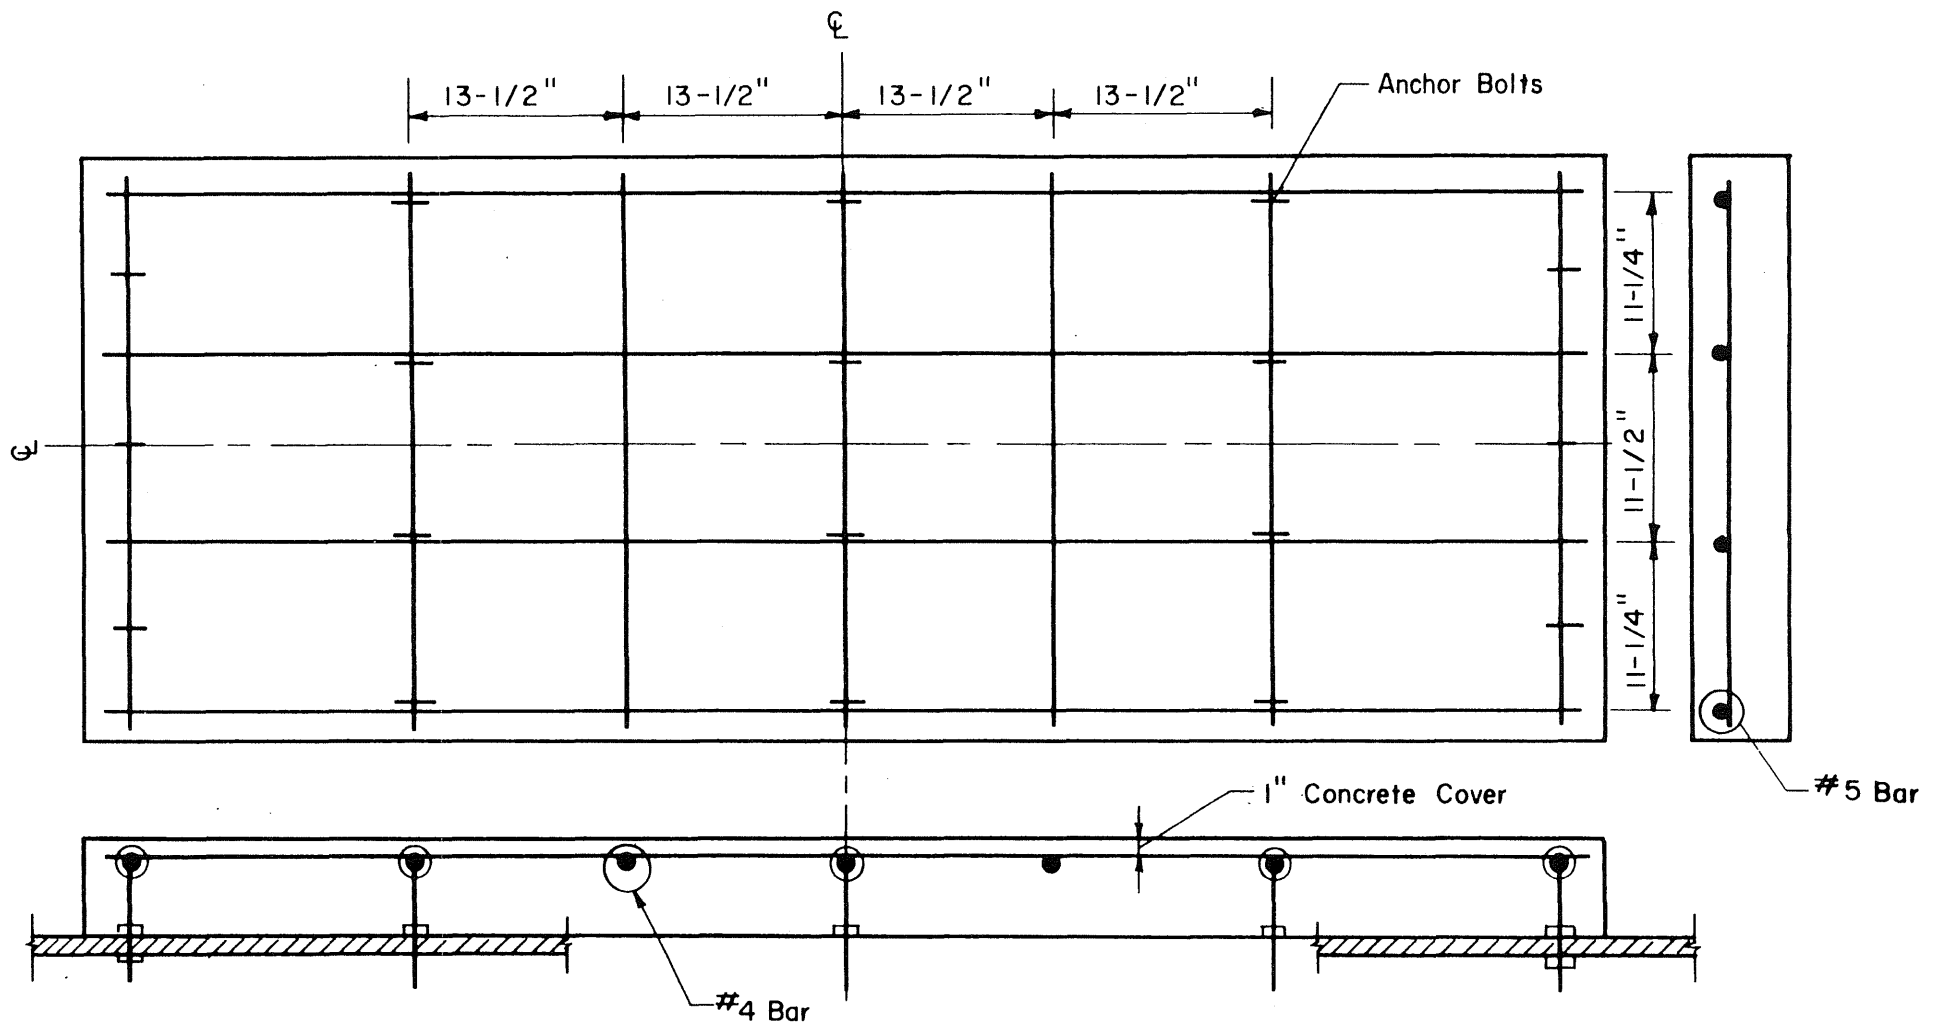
LAYOUT OF REINFORCEMENT – TYPE B – PHASE 2
